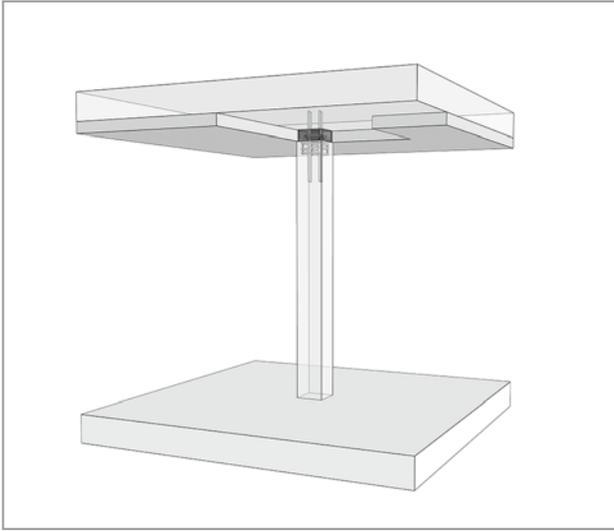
Connection detail with detailed Schöck Sconnex® model
